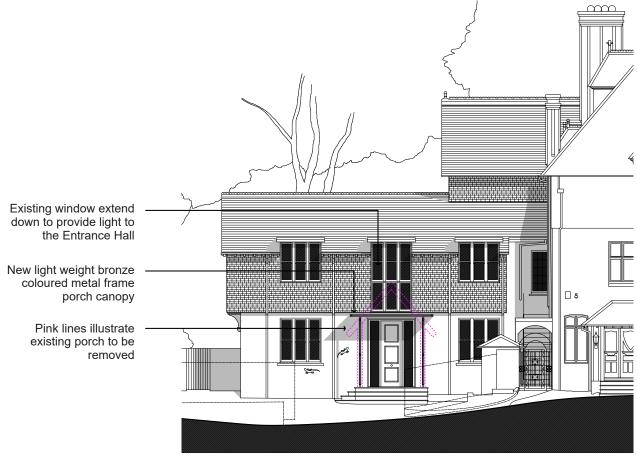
Proposed front elevation showing scale of existing porch and proposed new window and canopy
